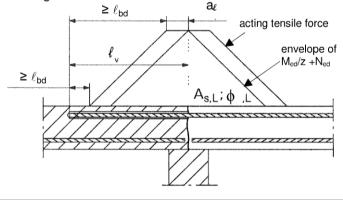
Overlapping joint at a foundation of a wall or column where the rebars are stressed in tension
